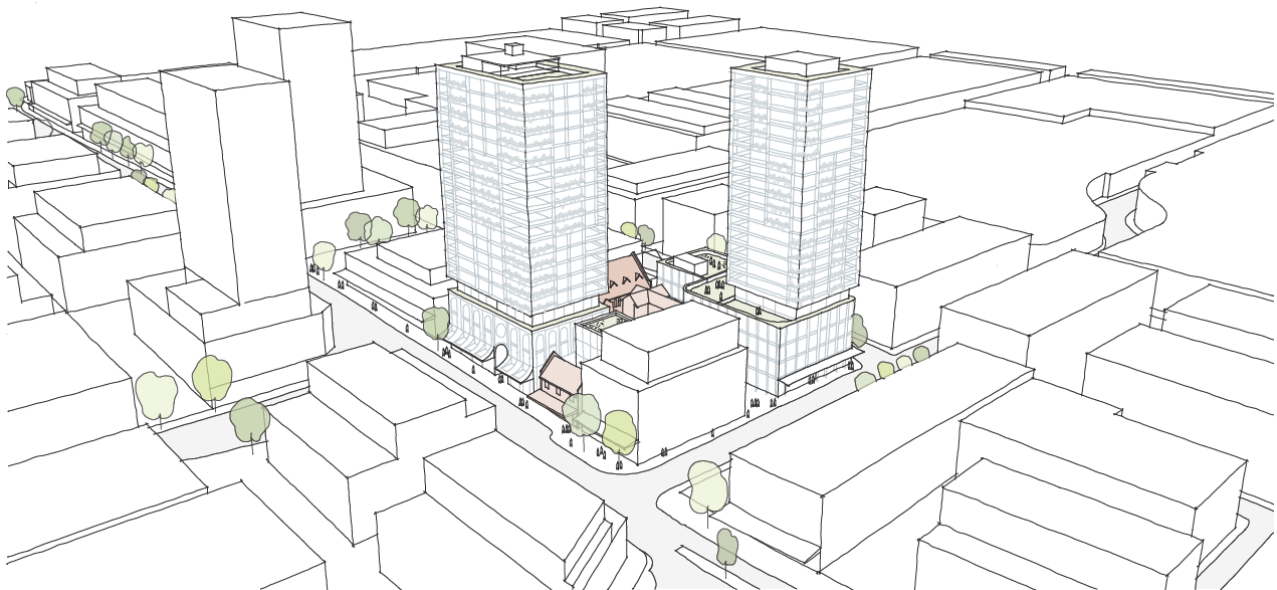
Proposed indicative built form, looking from the northern end of Great North Road (note. The towers shown outside of the subject site are fabricated).
